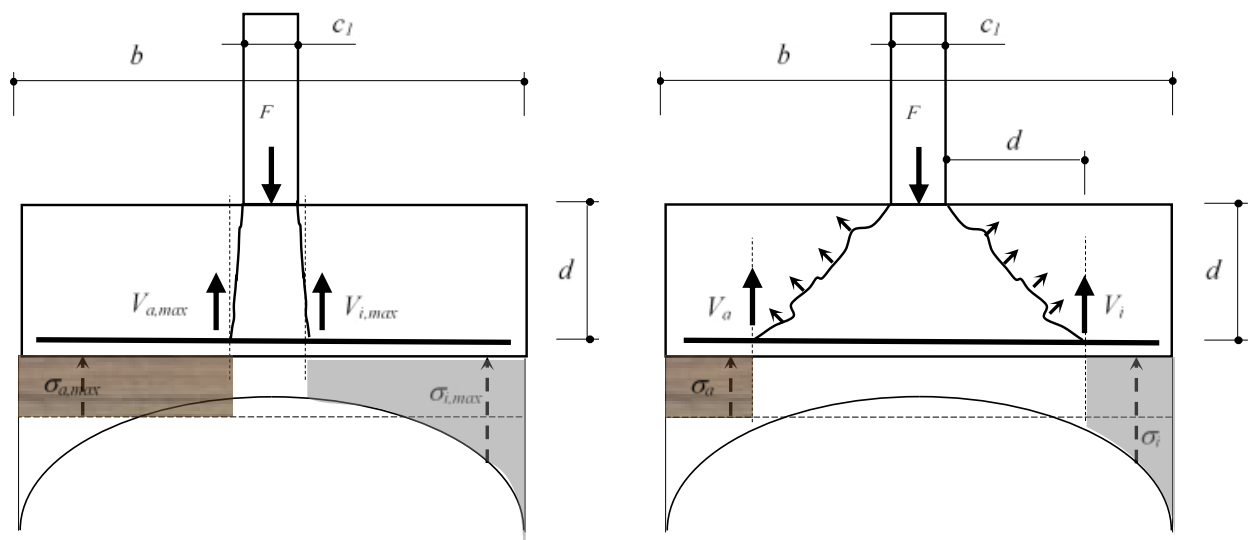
Failure of concrete footing; crushing of concrete and shear-tension failure
